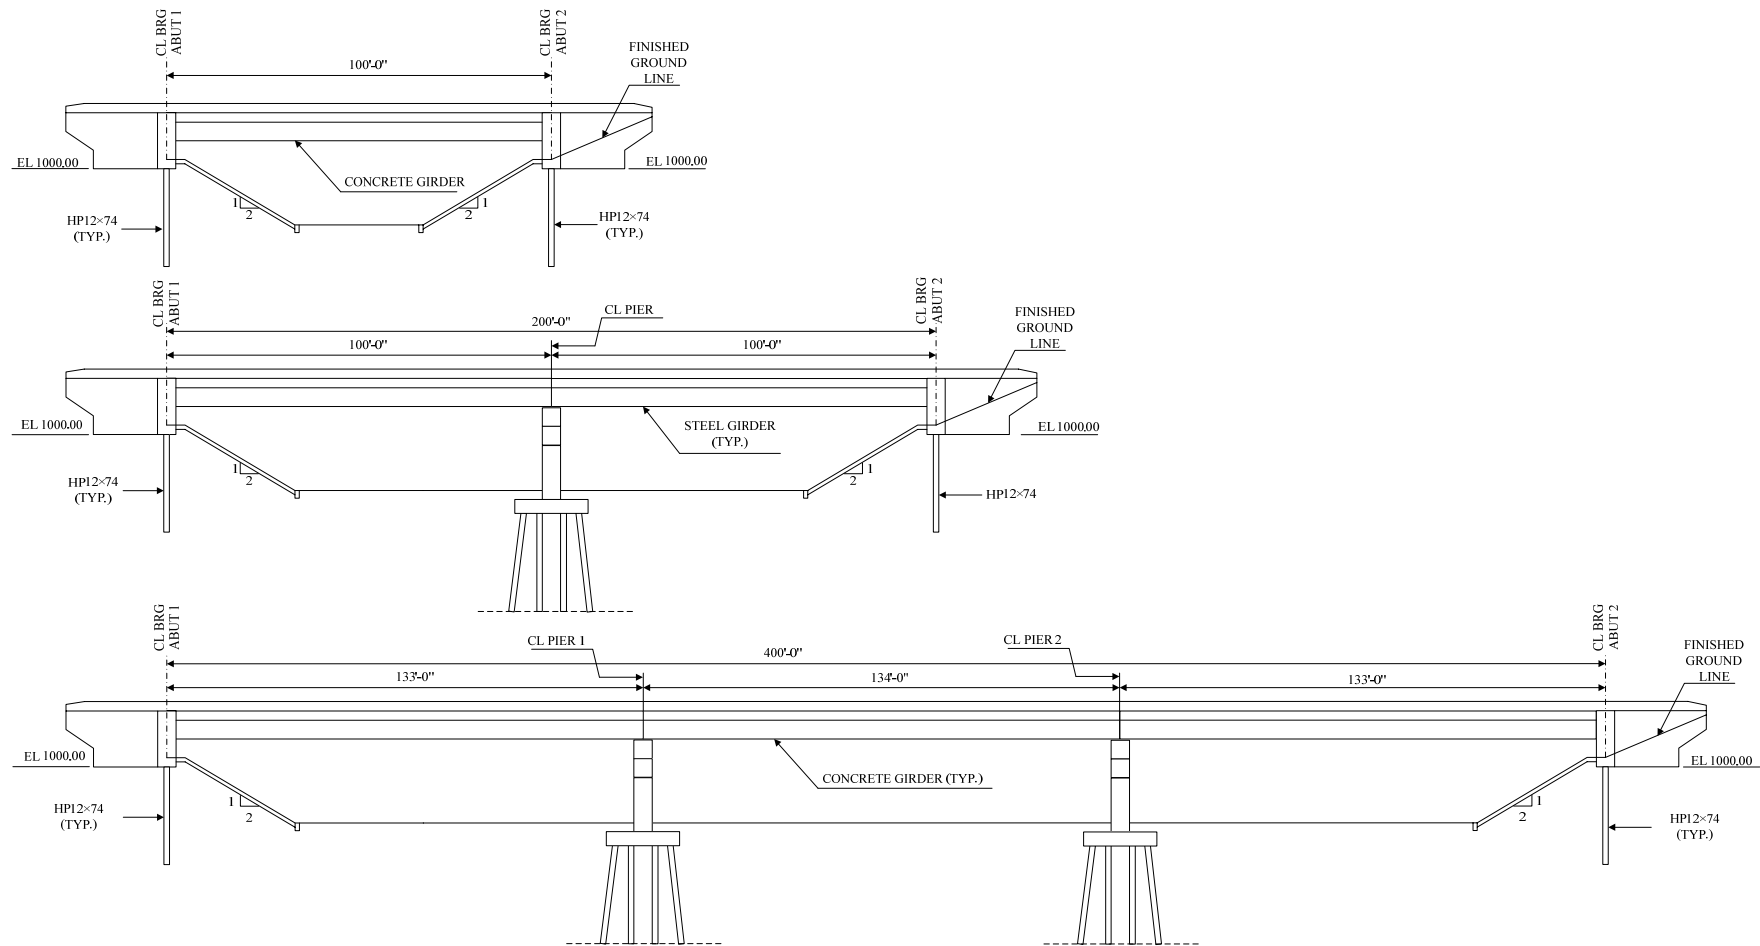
Bridge Elevation, Top – Example 1, Middle – Example 2, Bottom – Example 3.
